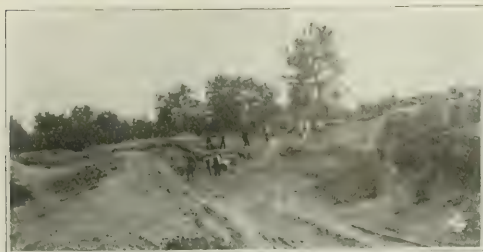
SAND AND GRAVEL PIT BEING WORKED BY SPANISH LABOR, DIRECTED BY A DETAIL OF ONE OF OUR ROAD-BUILDING REGIMENTS
